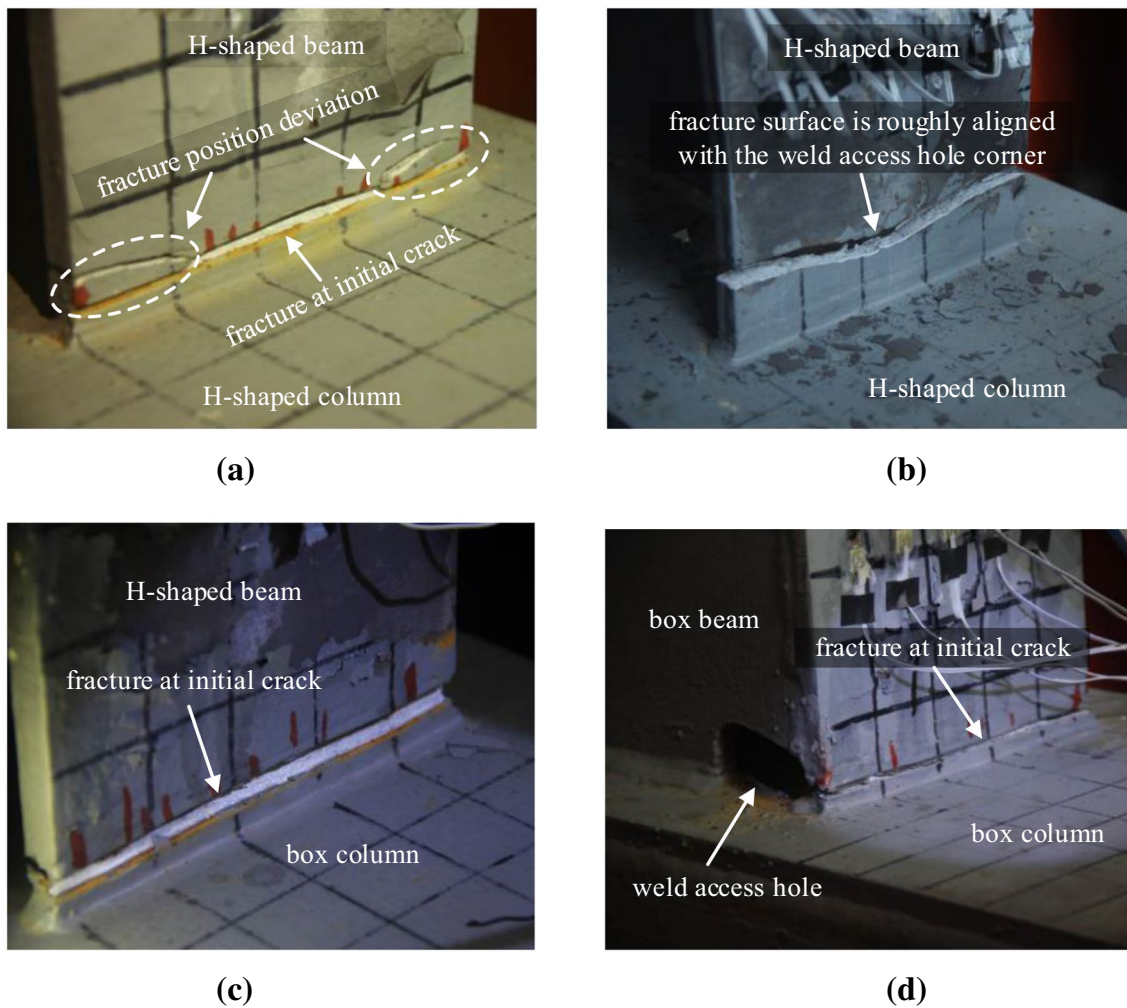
Fracture position at the beam flange: a Specimen I, b Specimen II, c Specimen III, and d Specimen IV
